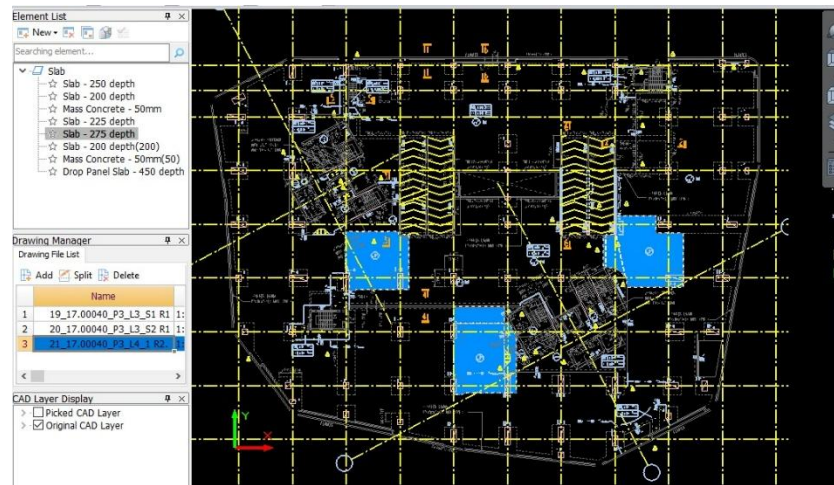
62 Johor Apartment Greenland Danga Bay Slab Rebar Measurement
